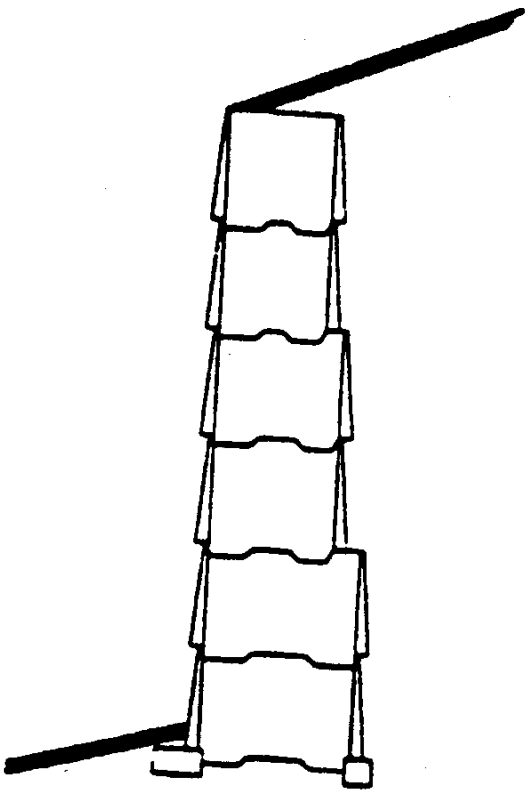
A Typical Mechanically Stabilized Earth Gravity Walls
